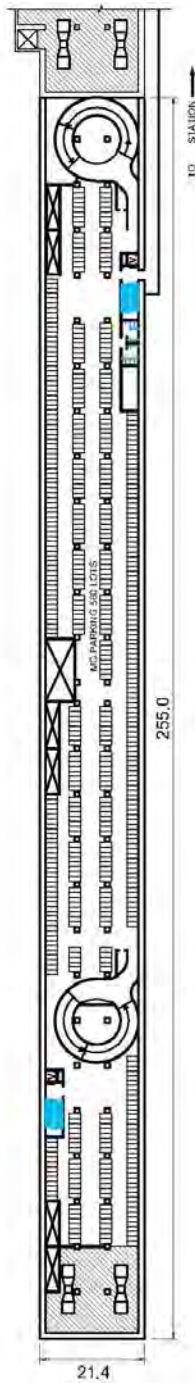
Facility Plan for Tran Hung Dao Underground Parking
